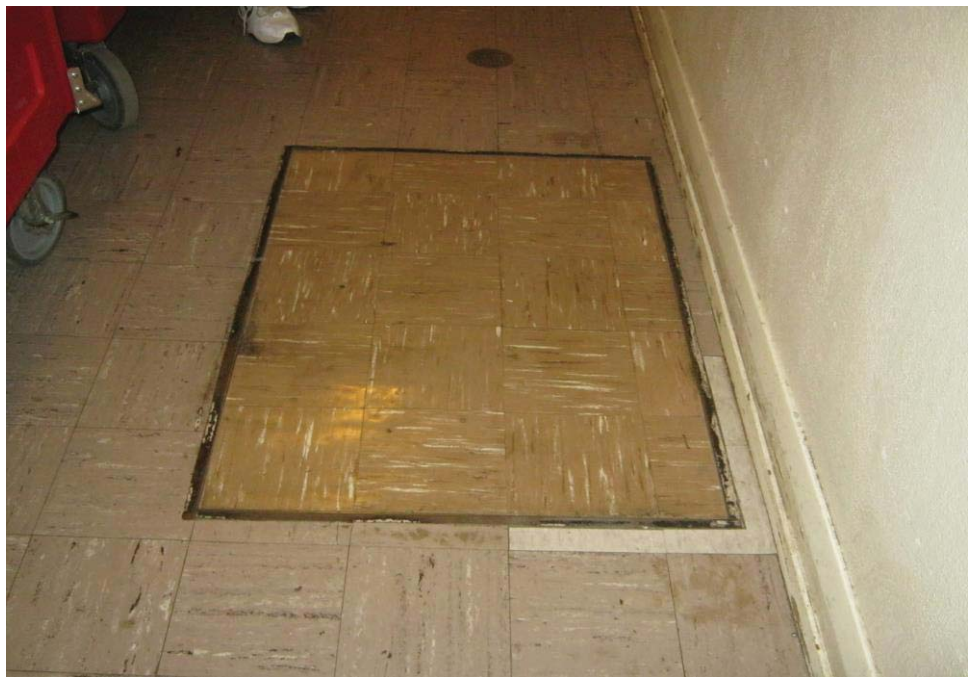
View of suspected former hydraulic lift in Room N2 of Building N.
